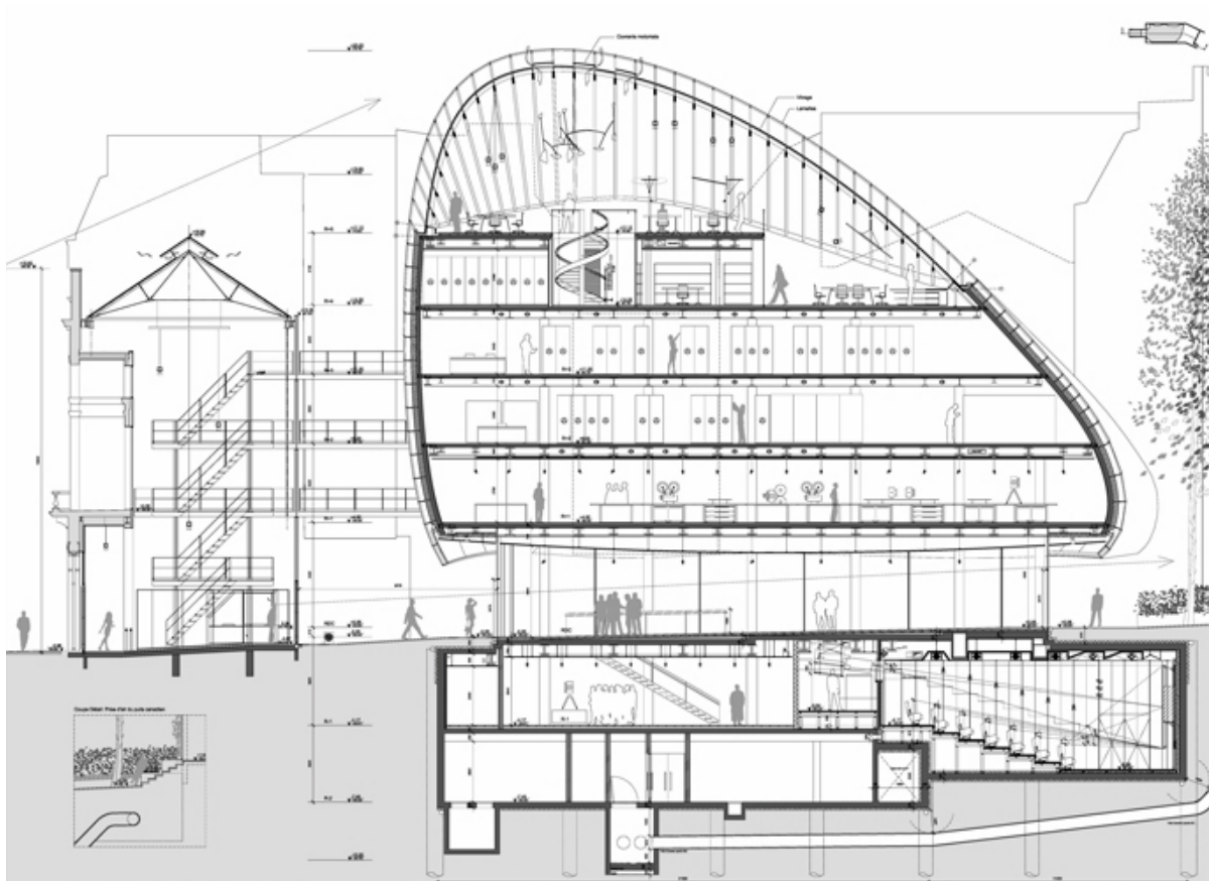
Structural section: Pathé concrete hull on rods and plinths, contact points at base and concrete hull embracing the steel structure frame. Available at: [fondazionerenzopiano.org/en/project/fondation-pathe.pdf](http://fondazionerenzopiano.org/en/project/fondation-pathe.pdf) (Accessed: March 2026).
